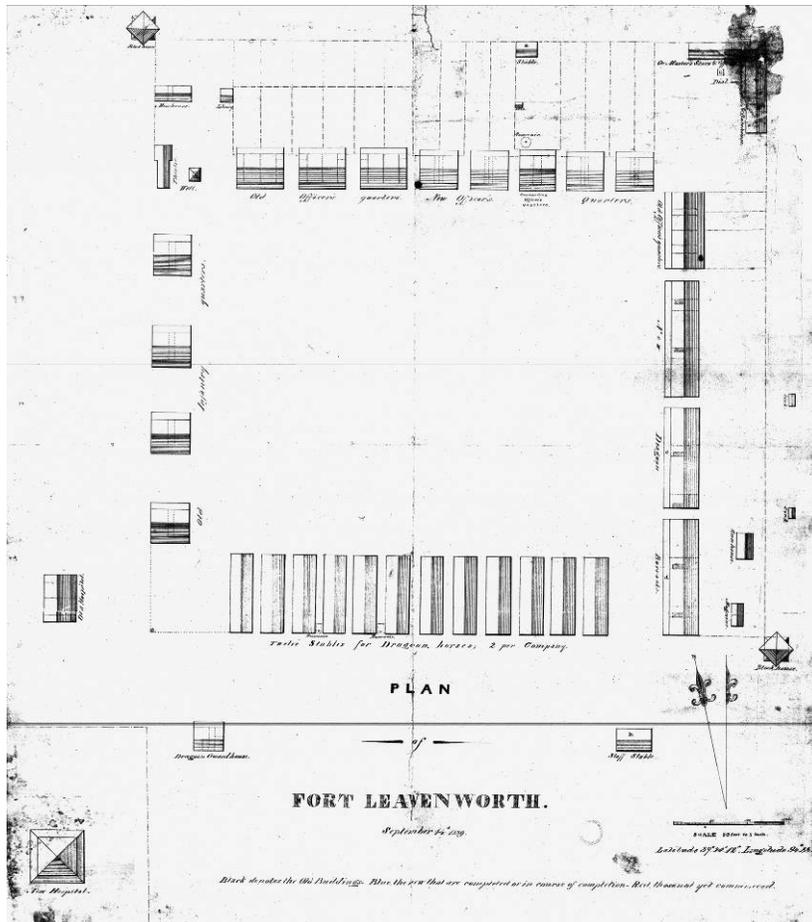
Site plan of Fort Leavenworth, Kansas 1839 (NARA College Park, RG 77 MISC Forts File Fort Leavenworth, KS).
